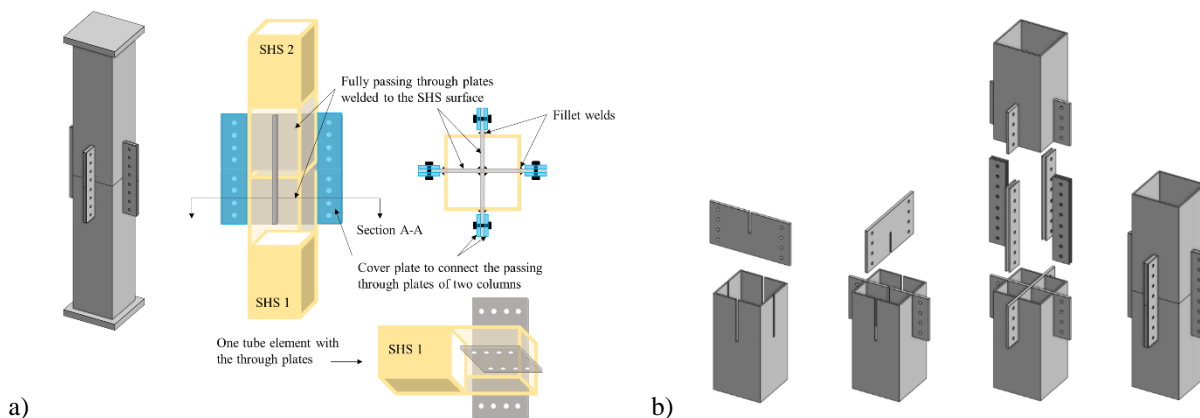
CS-1 connection: a) Schematic diagram; b) step-by-step assembly
